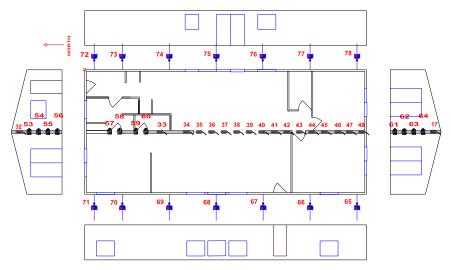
Plan view showing location of marriage line and tie-down load cells (14 ceiling and 4 roof load cells not shown)
